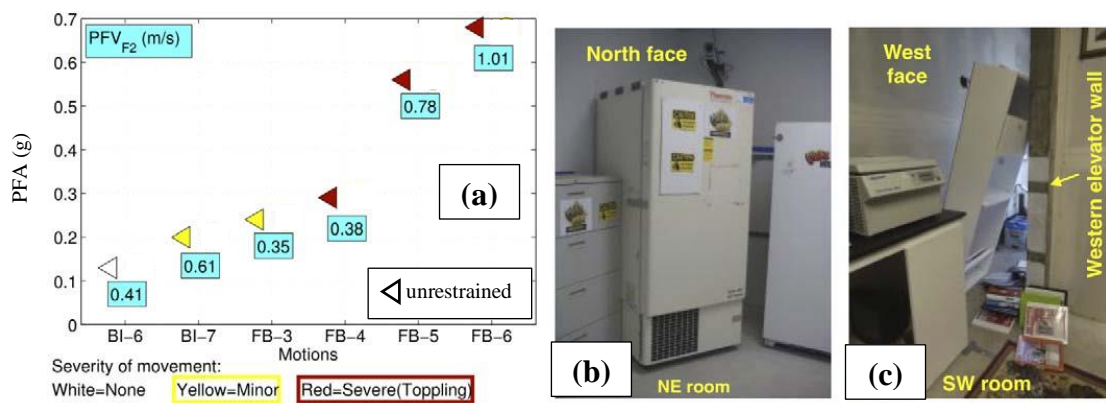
Disruption to equipment and nonstructural contents on the second floor (a) motion of unanchored objects, (b) movement of the unanchored refrigerator after test BI-7, (c) overturning of a bookshelf after test for the fixed base (FB) building (Pantoli et al., 2016a) permission in APPENDIX F.
